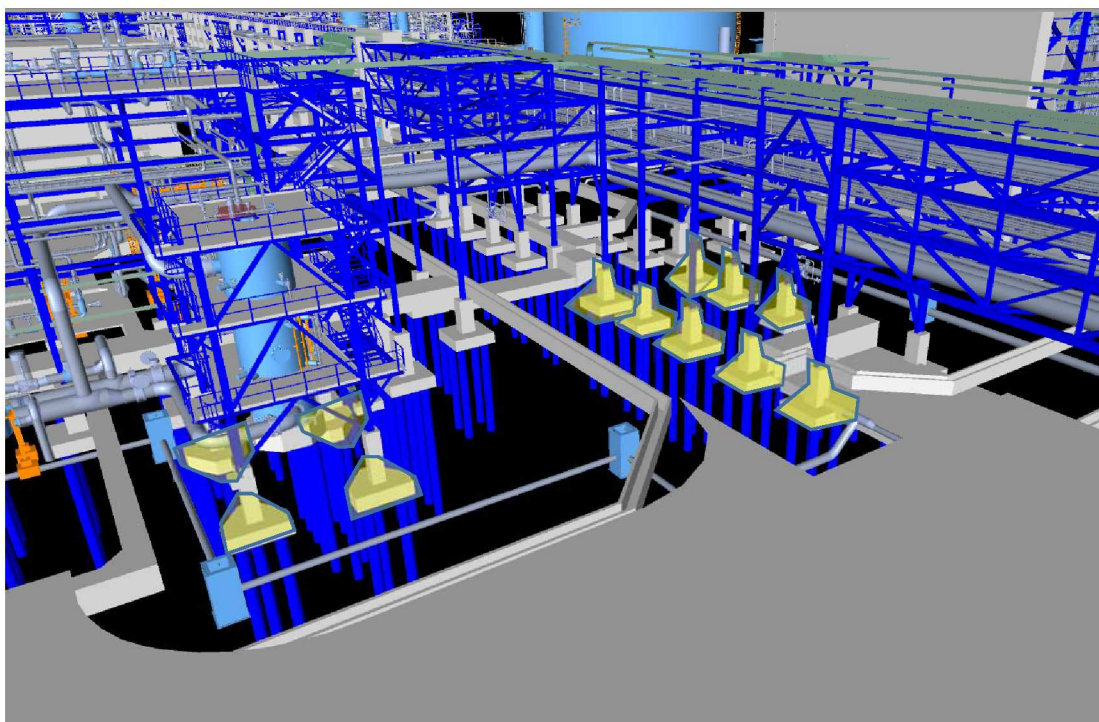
Concrete foundation for 053-STR-100 & 081-PR-300
